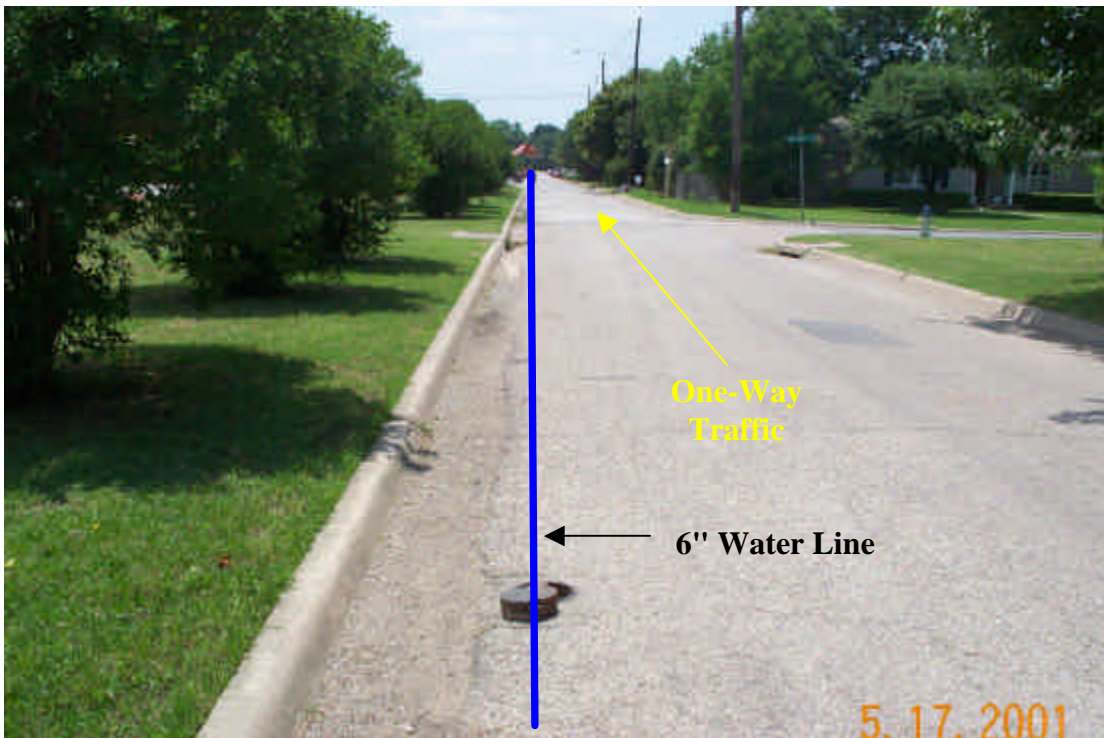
Looking south at valve north of Del Norte Lane. Storm Drain inlets located at intersection of road.
